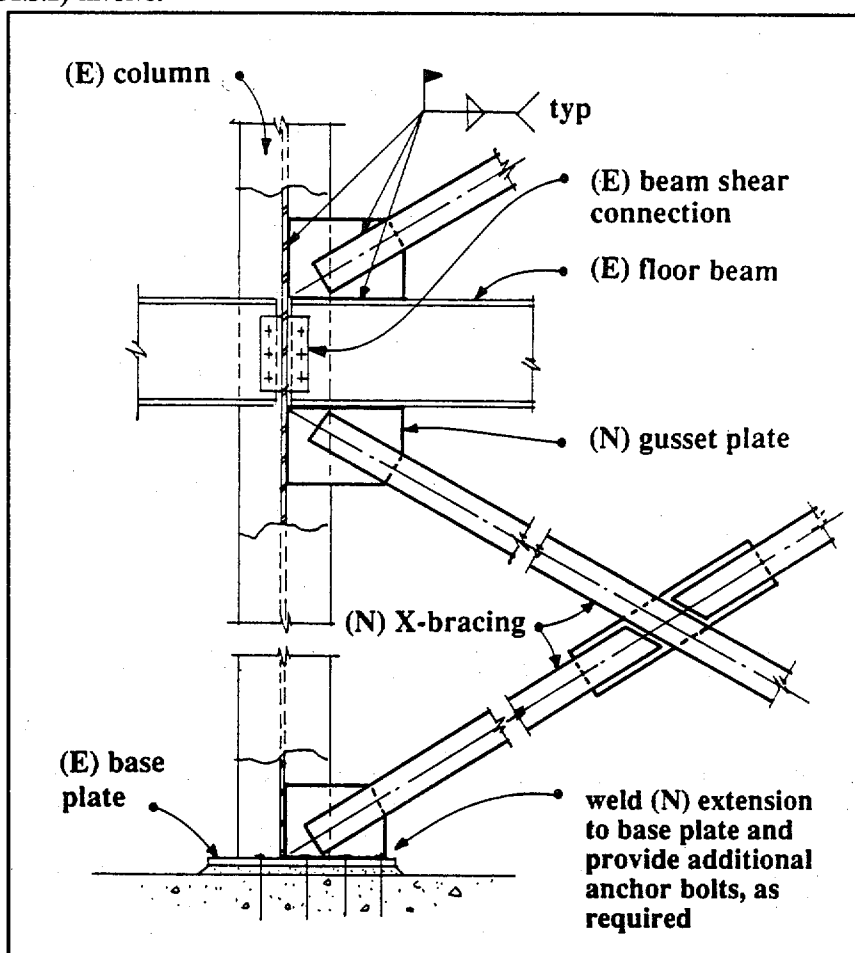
Providing new diagonal bracing to an existing steel frame.
